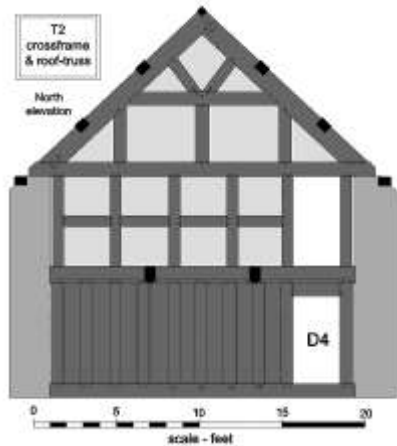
Old House Farm, Bredwardine. Reconstruction drawing of the crossframe dividing the two bays
